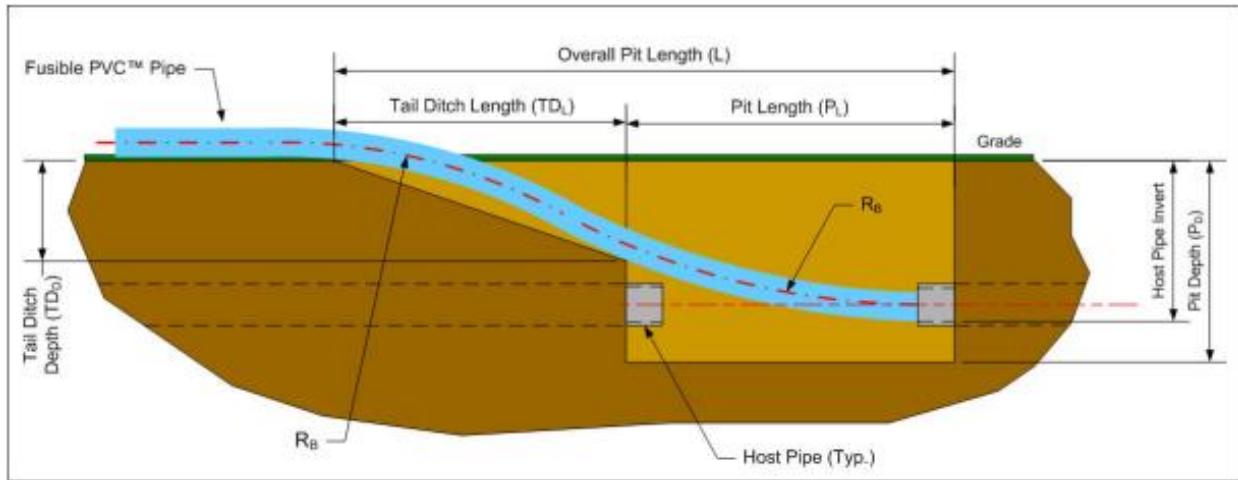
Typical sliplining, boring, and/or pipe bursting insertion/receiving pit (Underground Solutions 2016)
